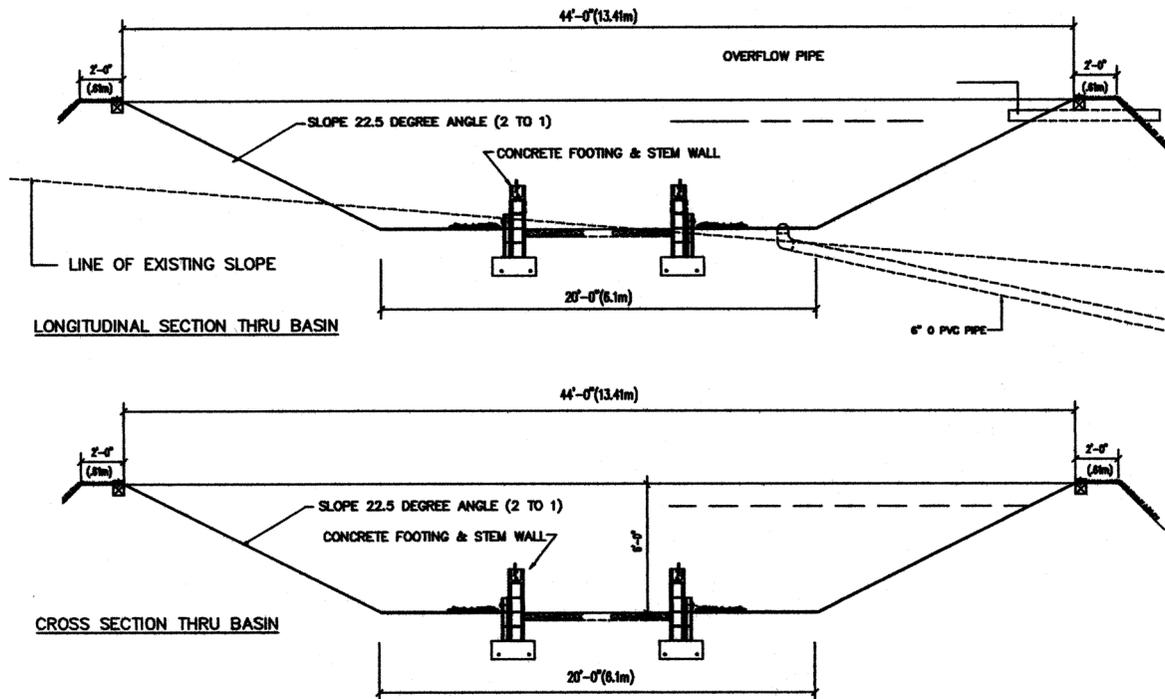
Cross section through test basin with stem-wall (crawl space) foundation.
